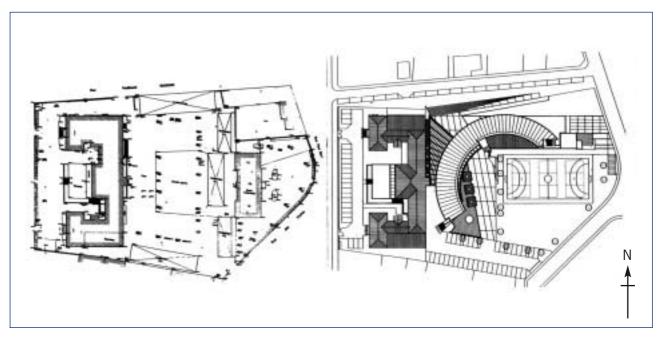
Left:* Site plan before refurbishment *Right:* Site plan after refurbishment
